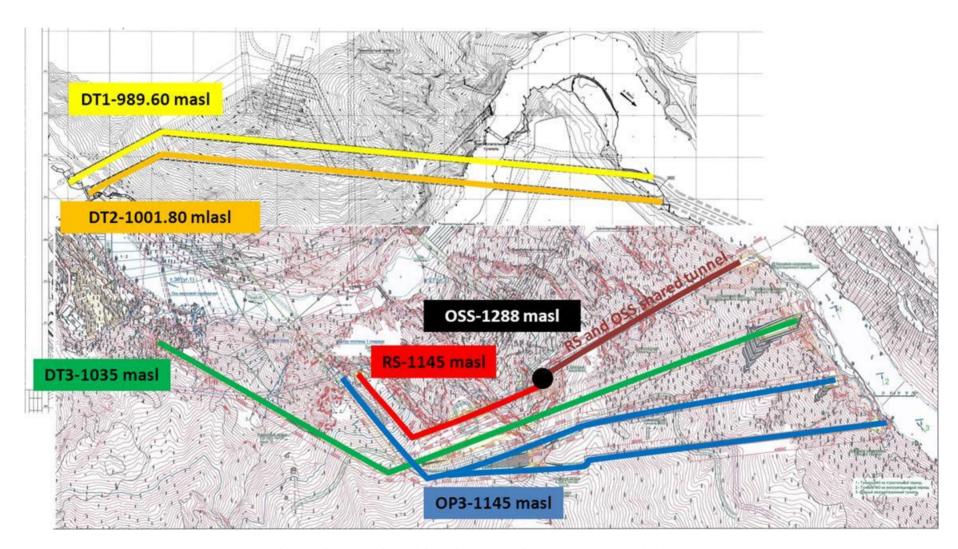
Plan view - Diversion and spillway structures - HPI scheme
